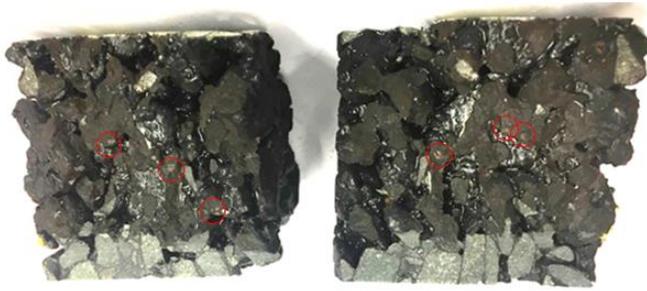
Fracture surface of a SCB specimen with 7% capsules
